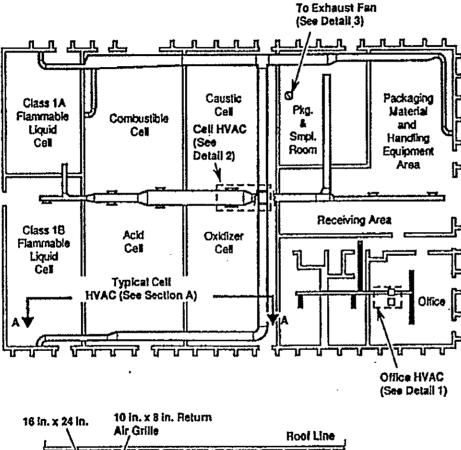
The 616 Facility Floor Plan. Nonradioactive Dangerous Waste
